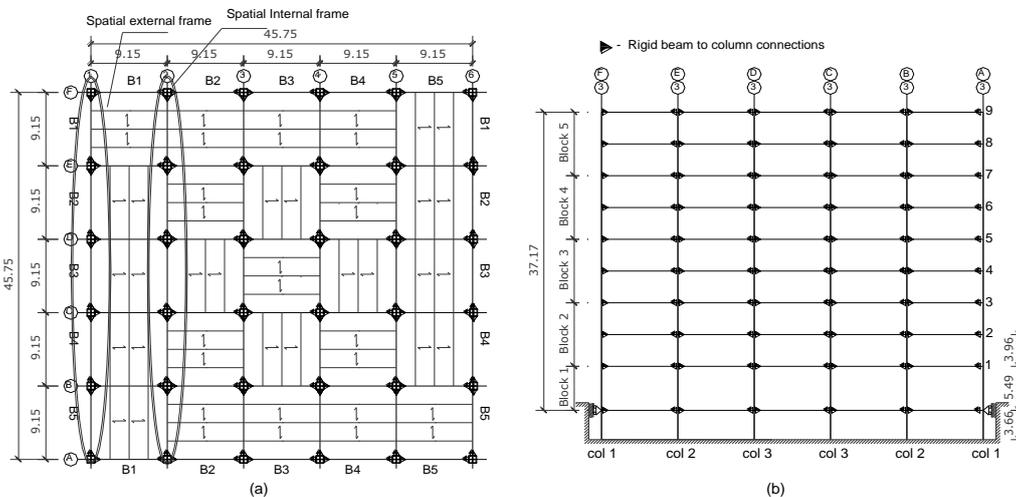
(a) Typical floor plan of the building with spatial MRFs and (b) spatial frame elevation
